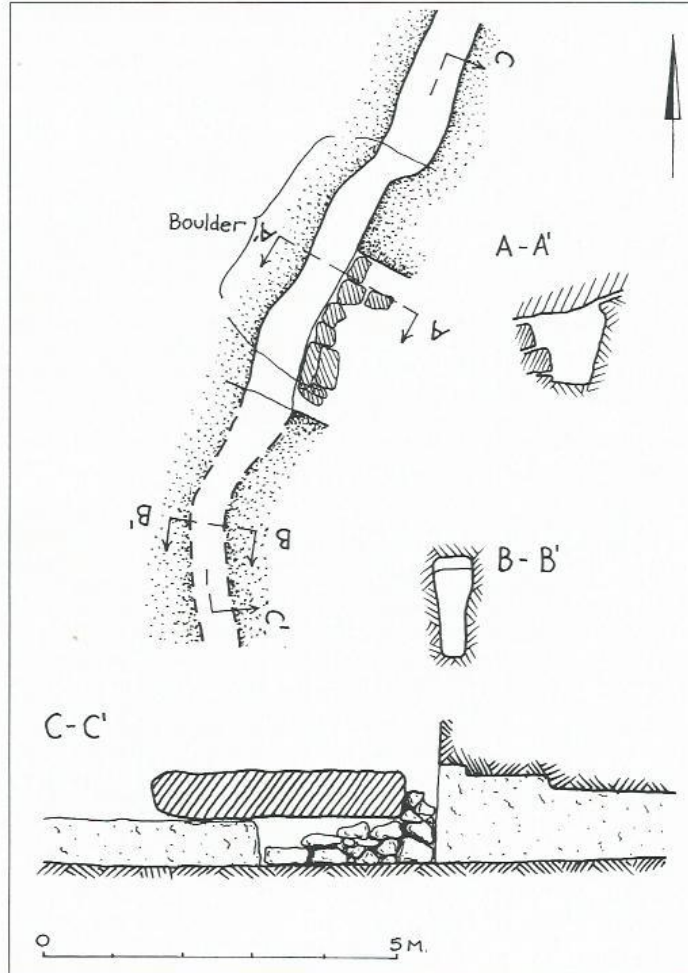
Channel II, detailed plan and section of segment close to Point 6, where open channel turns into tunnel.
